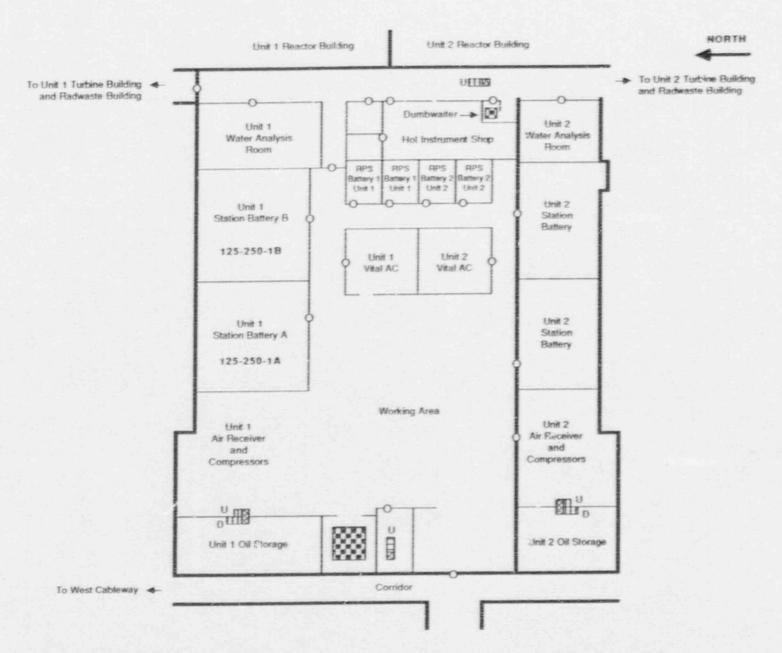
Hatch Units 1 & 2 Control Building Arrangement - Elevation 112 ft.
